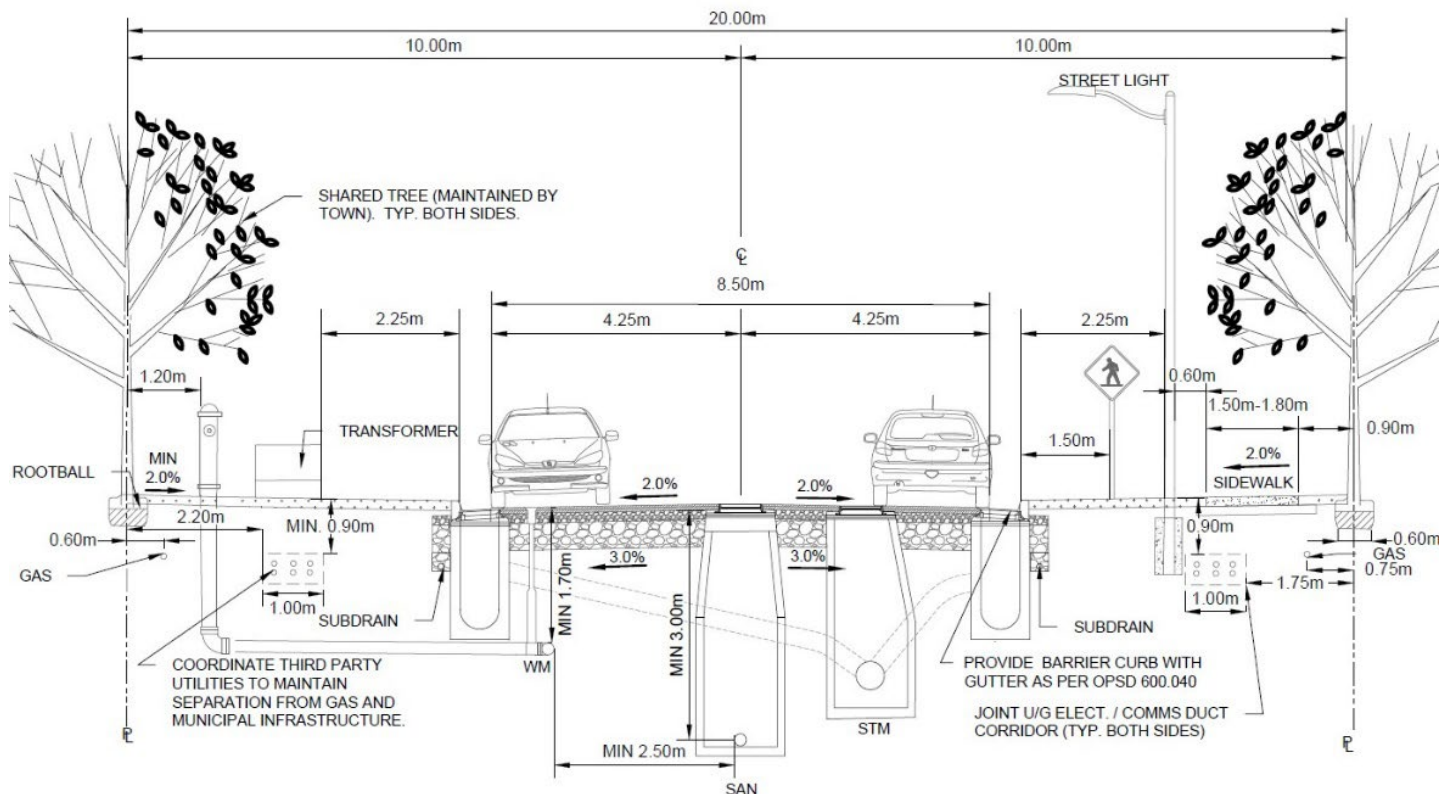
(Local Urban Road Cross Section, Envision Tatham, 2025).
